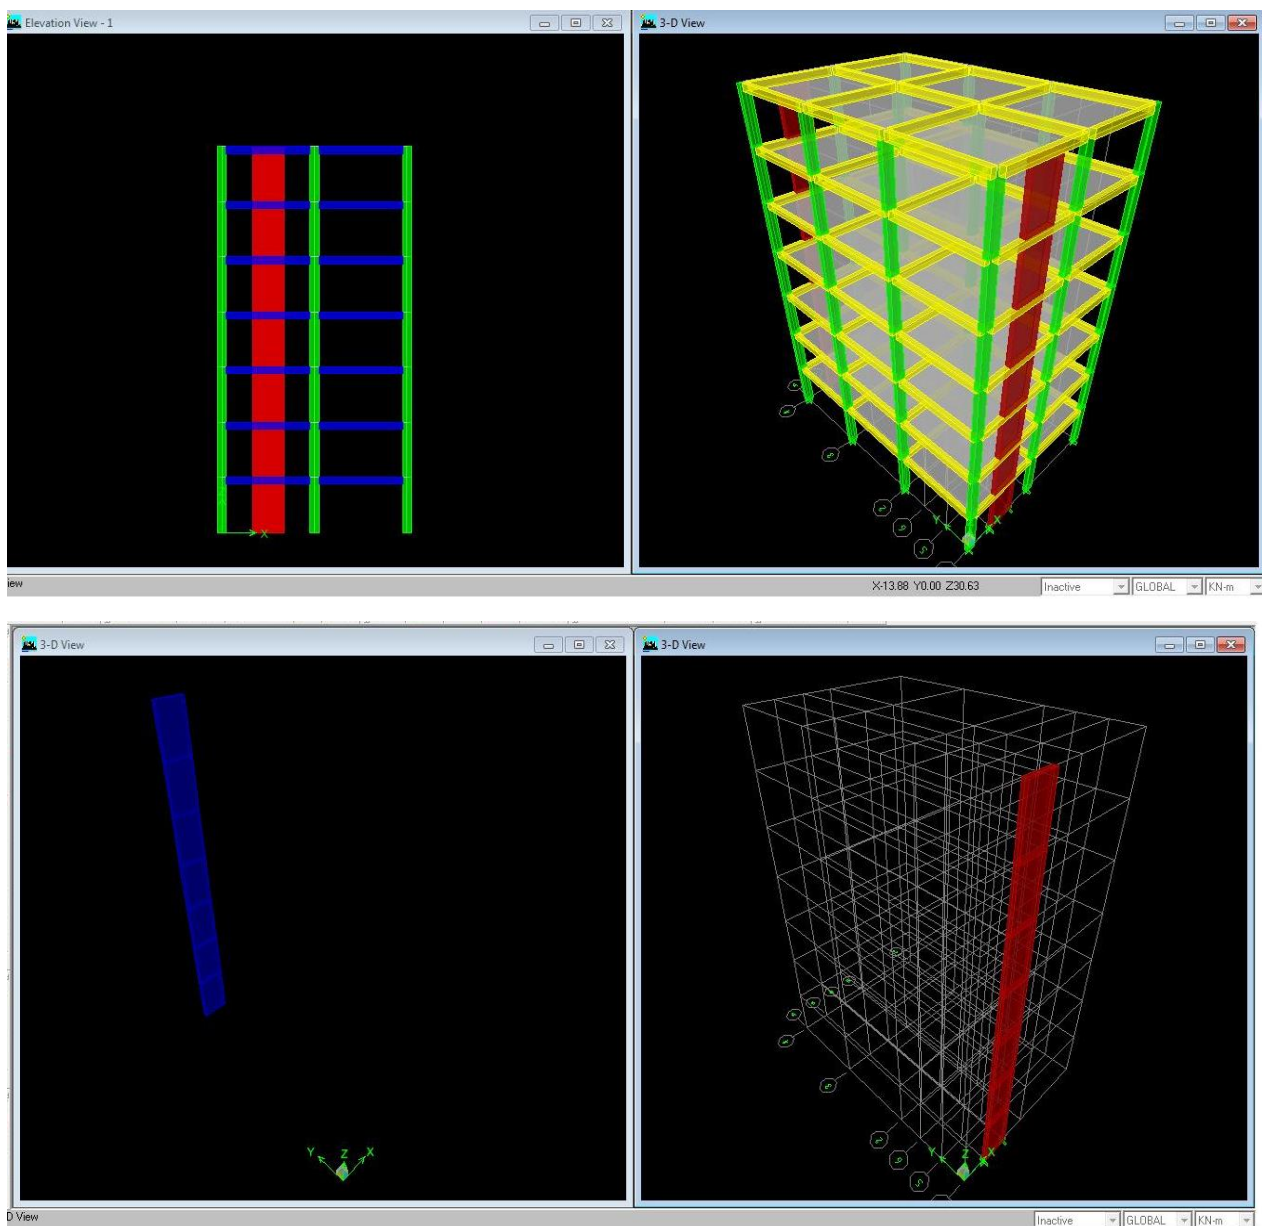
Plan & Elevation of Building Retrofitted With Shear wall
